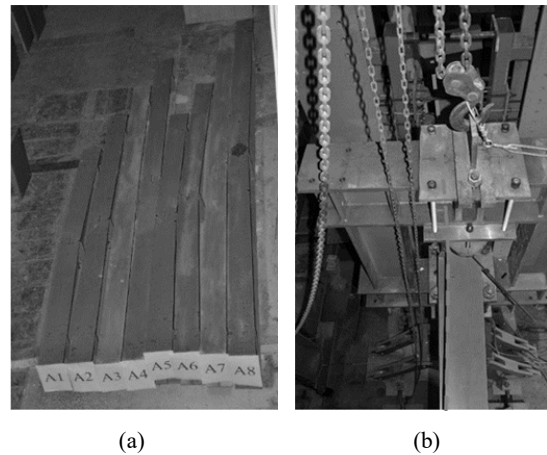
(a) All 8 tested beam specimens; (b) Failure mode of the tested specimen
